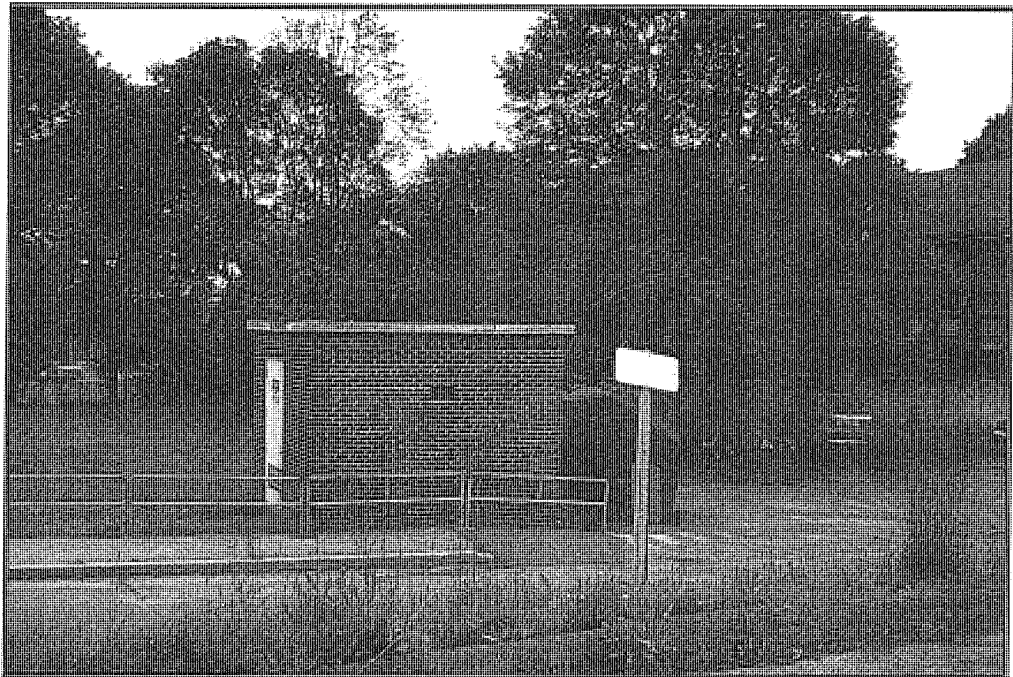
Transformer house between North Building (right) and Old Activities Center (not shown).
